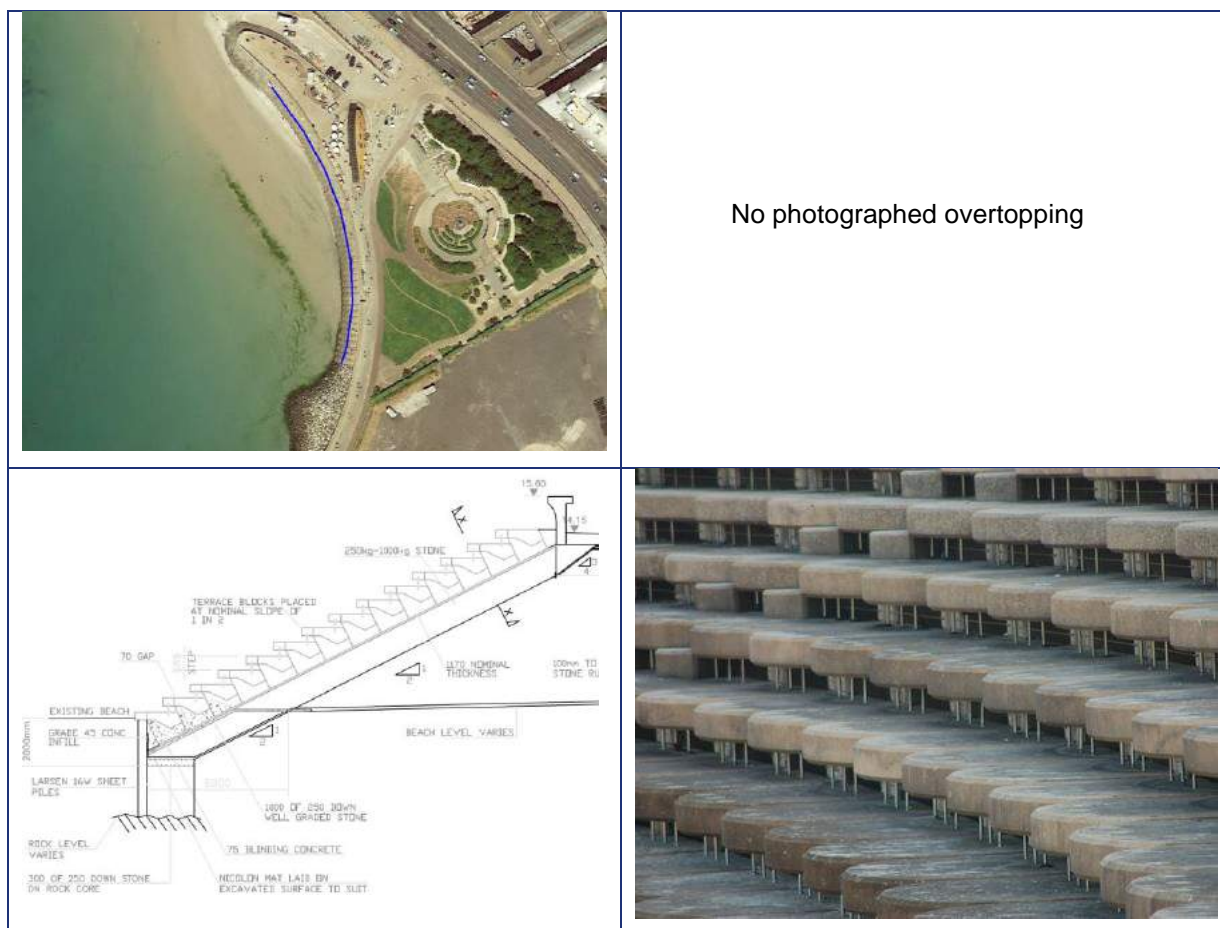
Structure and overtopping evidence at Structure 3: Terrace revetment
